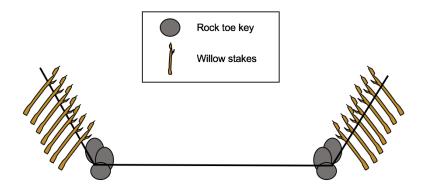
Cross-sectional view of bank stabilization treatment using willow stakes and a rock toe key.
